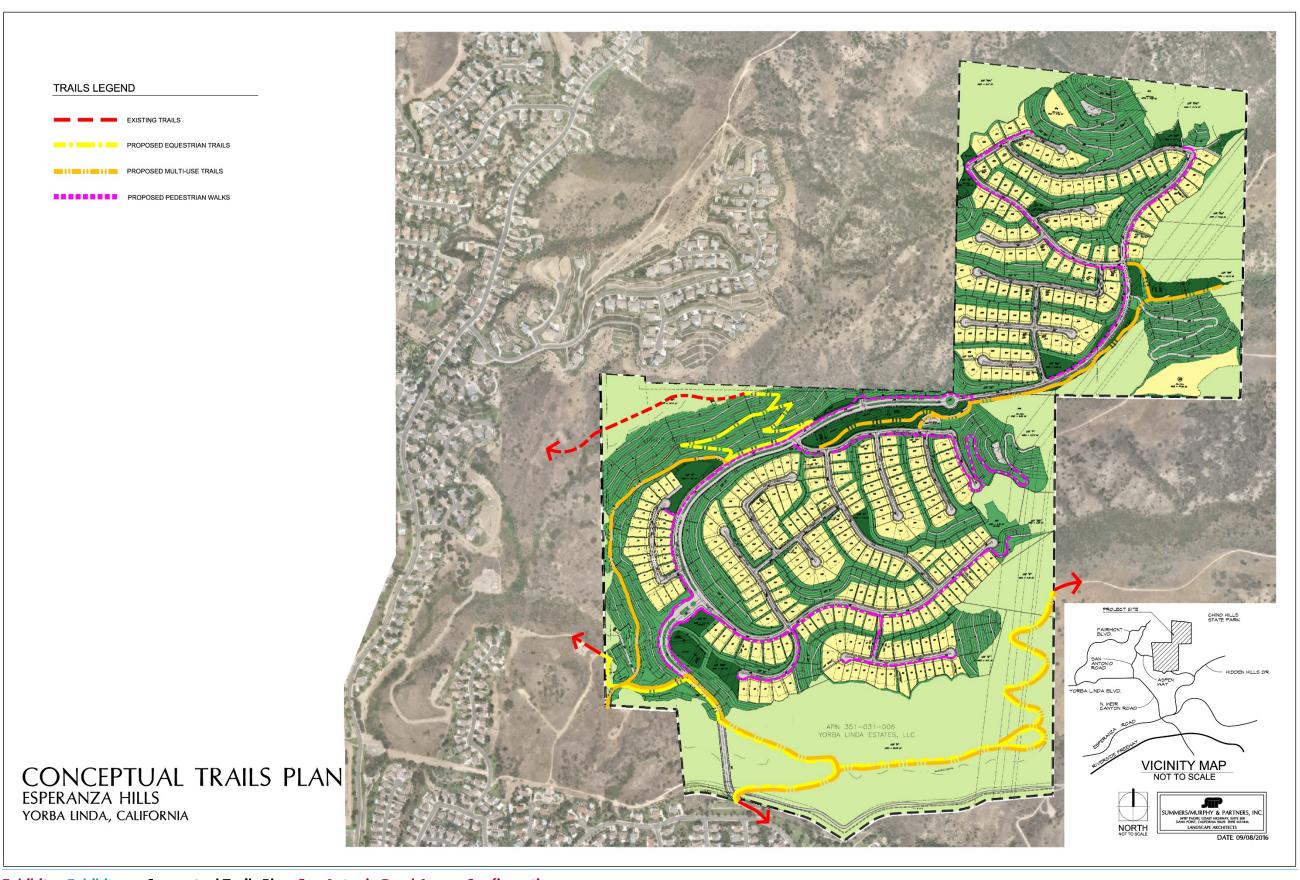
Exhibit 11 - Conceptual Trails Plan, San Antonio Road Access Configuration
